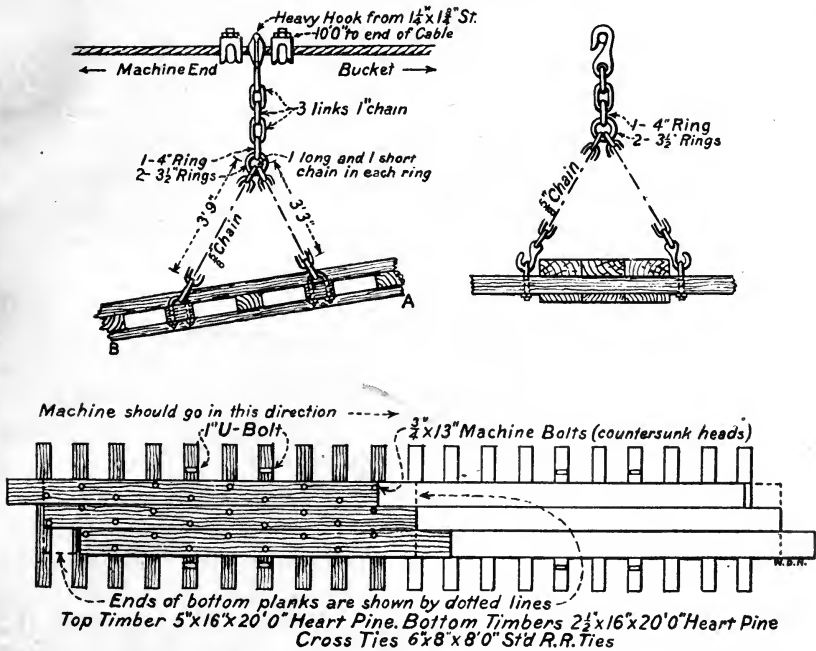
Sectional track for a rotary-scraper excavator with skid and roller mounting.
